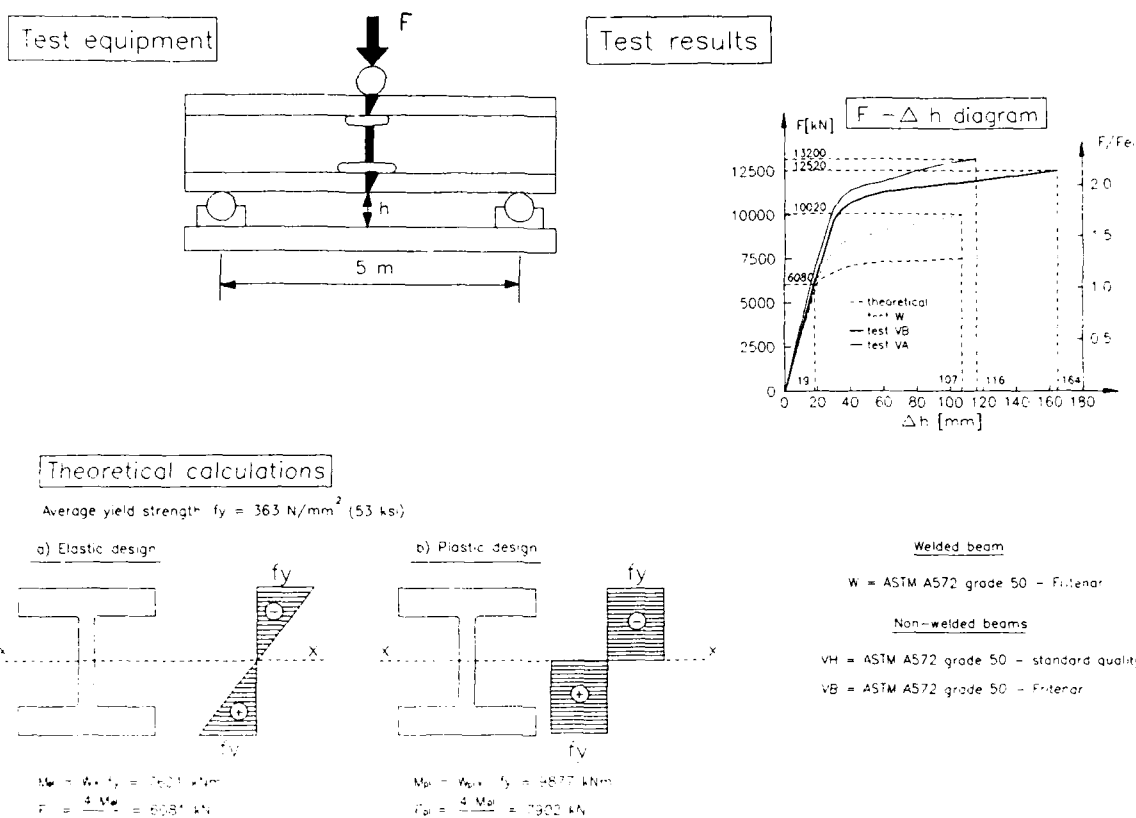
Bend test on reference and butt-welded Jumbo beams W14"x730
